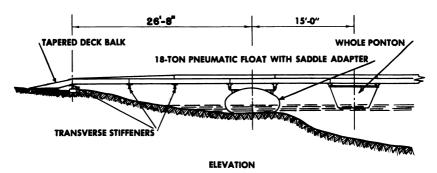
Floating bridge, M4, with grounded 18-ton pneumatic float in end section.
